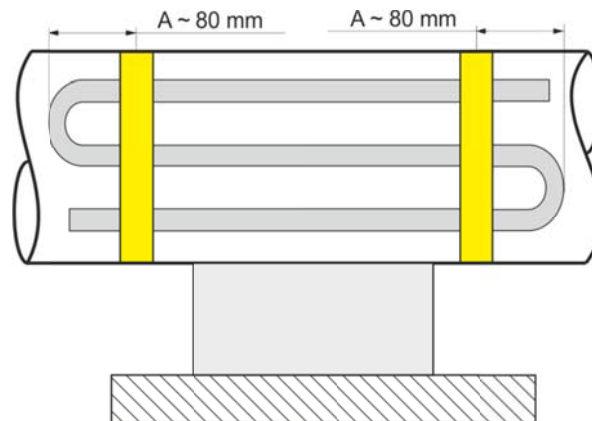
Guiding the heat tape in the vicinity of pipe bearings
